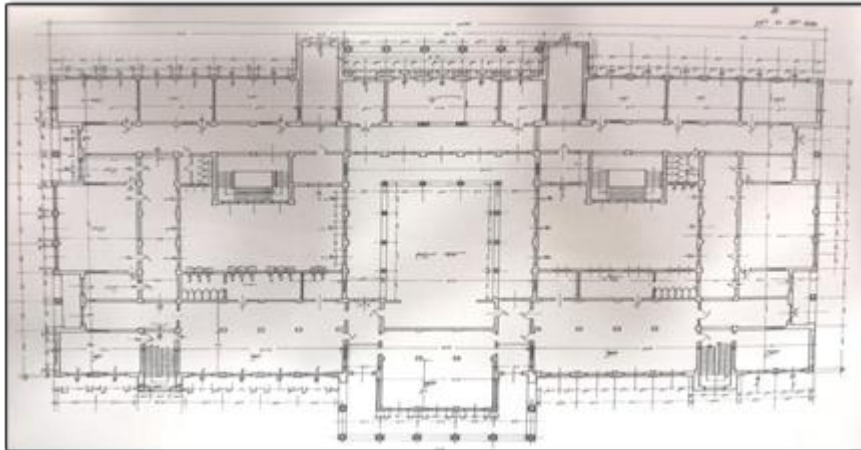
Gazi Education Institute, Ground Floor Plan, (Yavuz, Y, Empire to Republic Architect Kemalettin 1870-1927, Source: GEEA)
